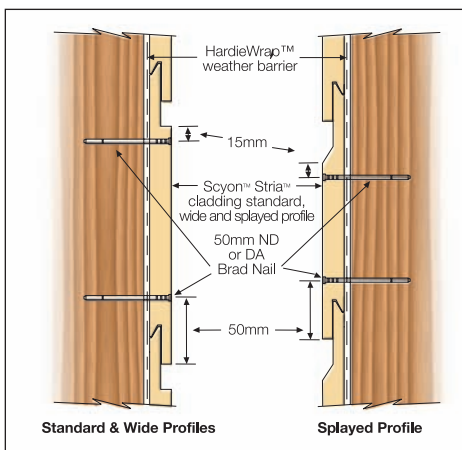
B FACE FIXING BRAD NAILS: FOR ALL 3 SCYON STRIA CLADDING PROFILES
